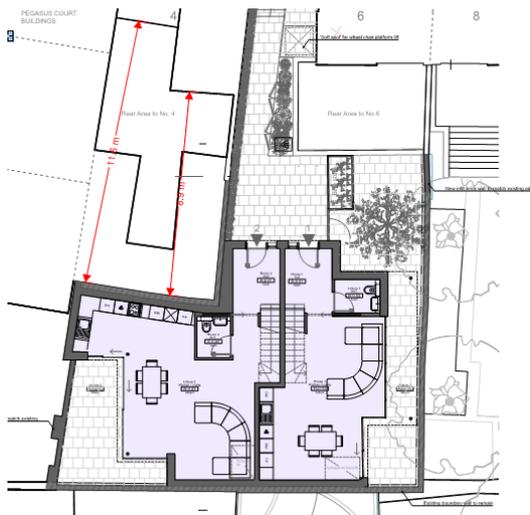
Proposed lower ground floor in relation to no. 4 Shaftesbury Road
